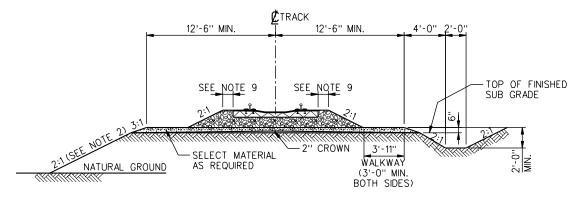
Roadbed Section from SCRRA ES 1801-02
